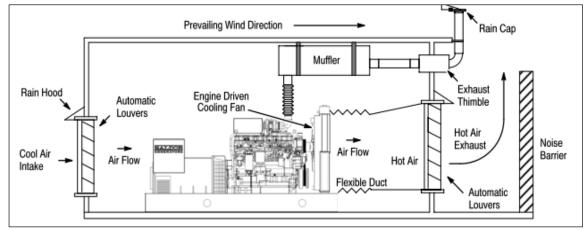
Engine Mounted Radiator Cooled System with Wind/Noise Barrier
